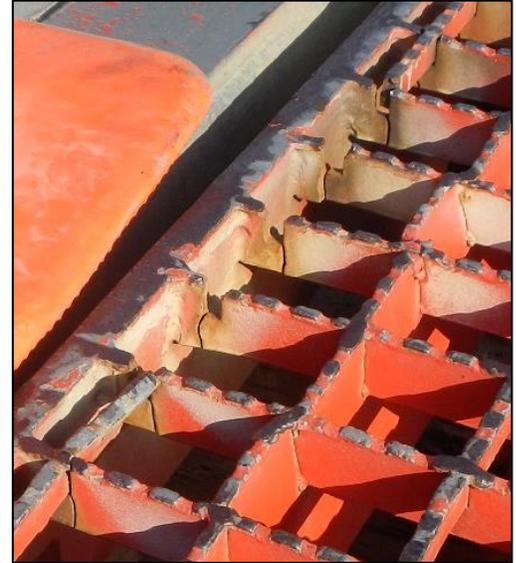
Missing Supplemental Bars and Cracking of Cross Bars at West end.
